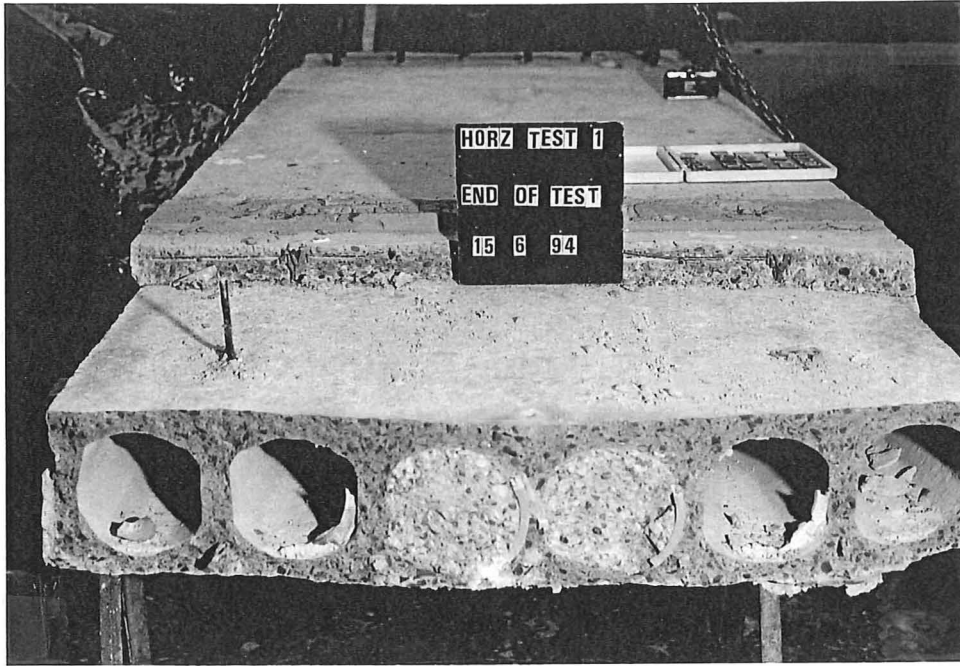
Fractured hollow core section after removal, showing intact plastic dams in two inner voids
